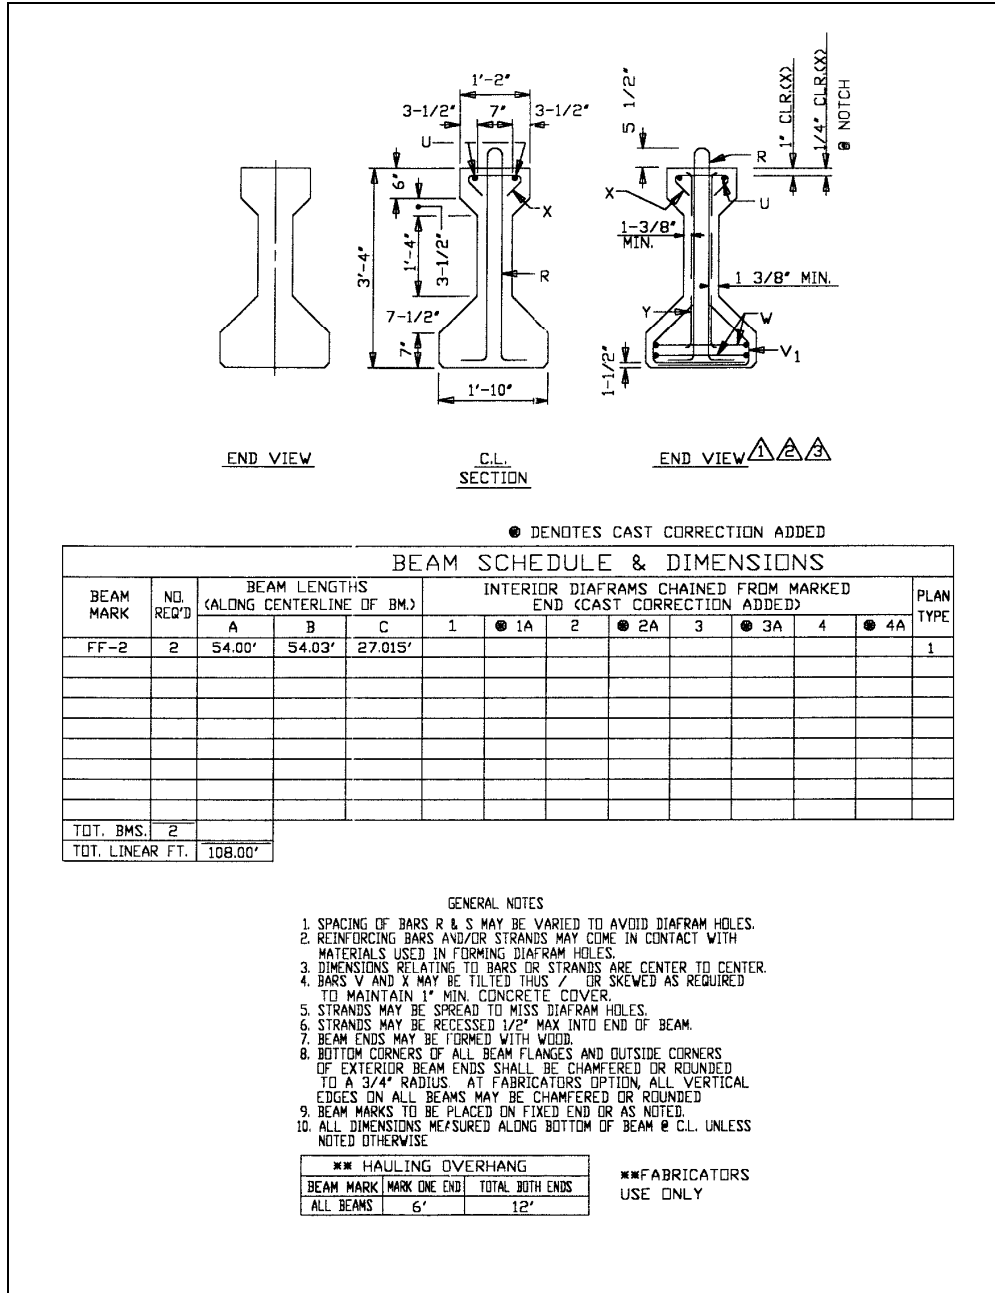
Normal-strength concrete test beam shop drawing (Part 2 of 3)
